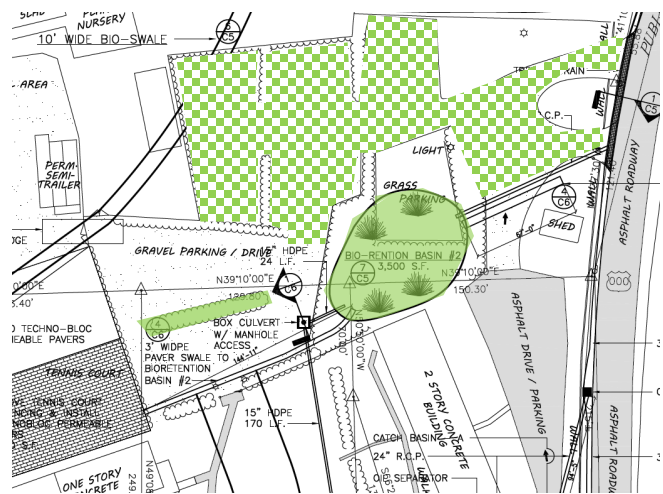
Bolongo Bay, St. Thomas renovation plans included conversion of an existing gravel parking lot (considered impervious) to permeable pavers and the installation of several bioretention facilities integrated into the resort's landscaping.
